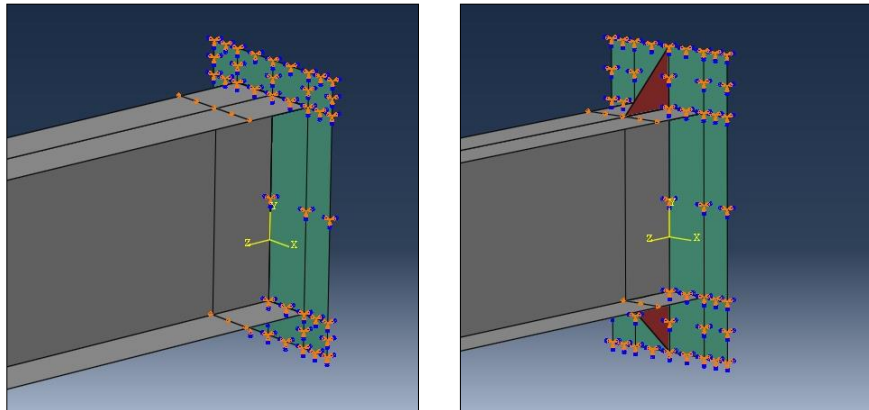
Applying Boundary condition to the unstiffened and stiffened end plate connection beams
